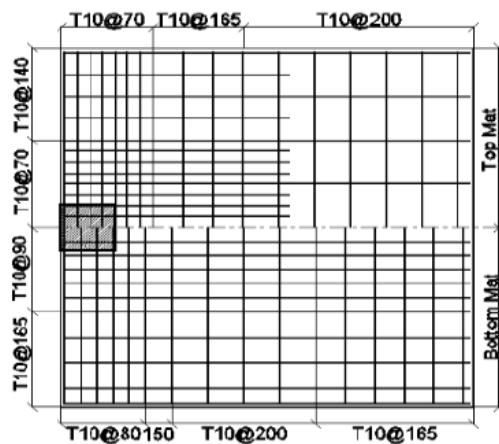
Layout of slab reinforcement for specimen SRR3.
